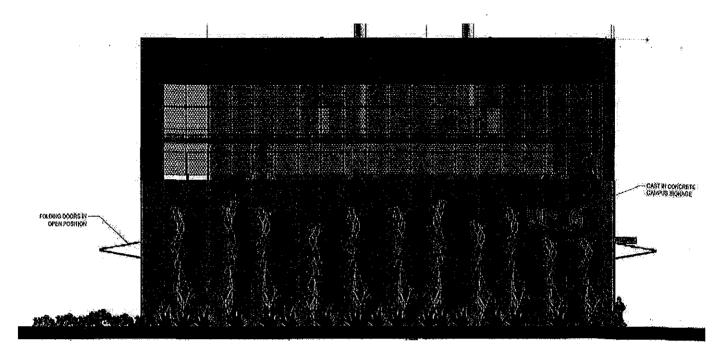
North Elevation Landscape-Cable/Vine System Concept
